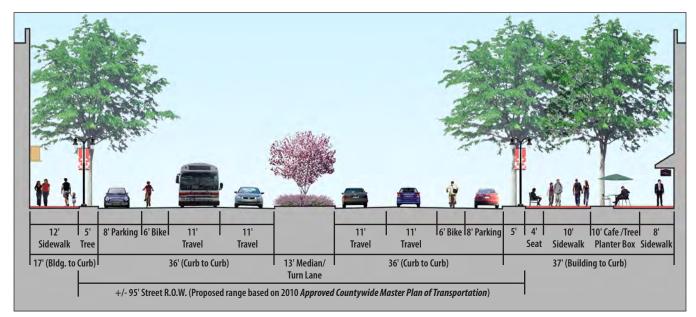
PROPOSED MID-TERM STREET SECTION—RHODE ISLAND AVENUE, WEST OF TRAFFIC CIRCLE, LOOKING WEST.
